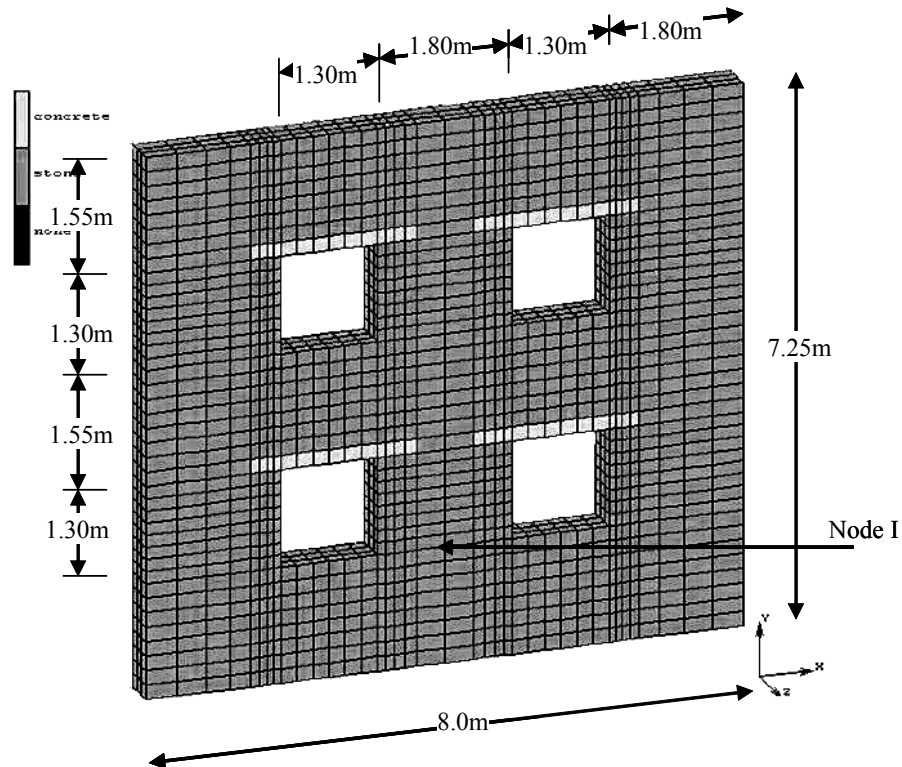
The finite element model of the masonry wall with the reinforced concrete lintels.
